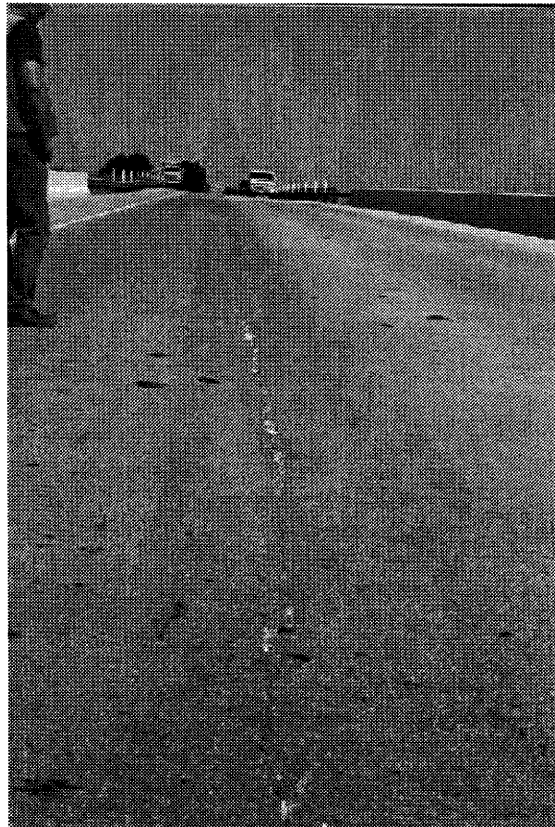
Longitudinal Deck Cracking on FM 730 Overpass (continued).
